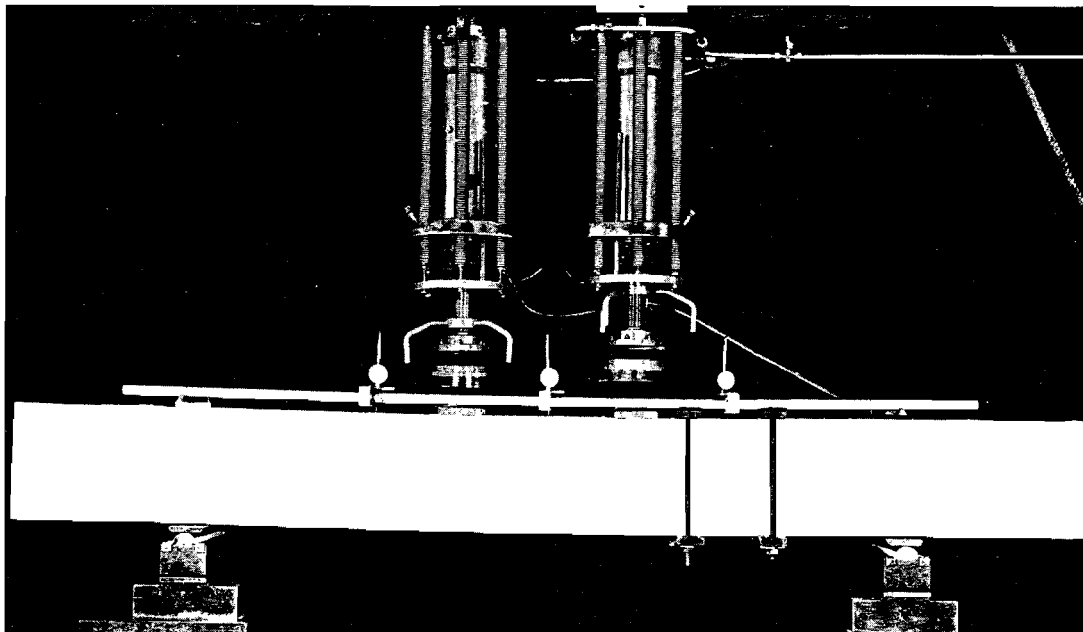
Testing arrangement. When the main shear crack had opened wide on the side of the beam provided with stirrups of steel St I, the beam was "bandaged" and further loaded up to failure.
